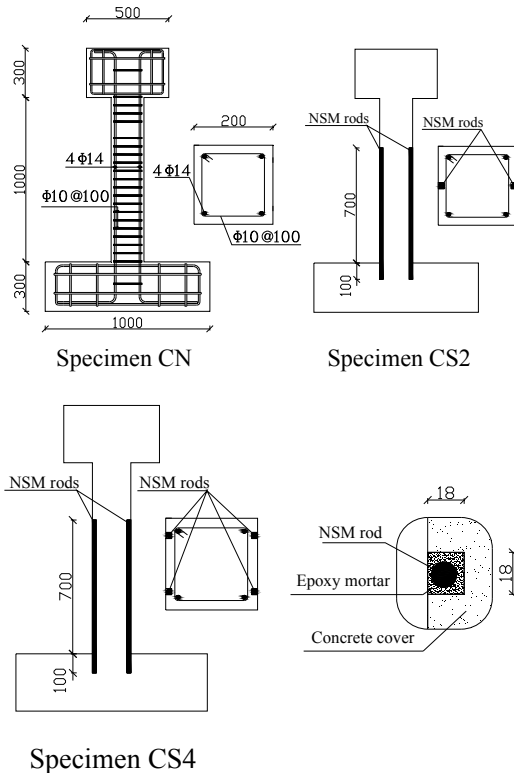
Dimensions, details of reinforcement and NSM strengthening for the specimens (Unit; mm)
